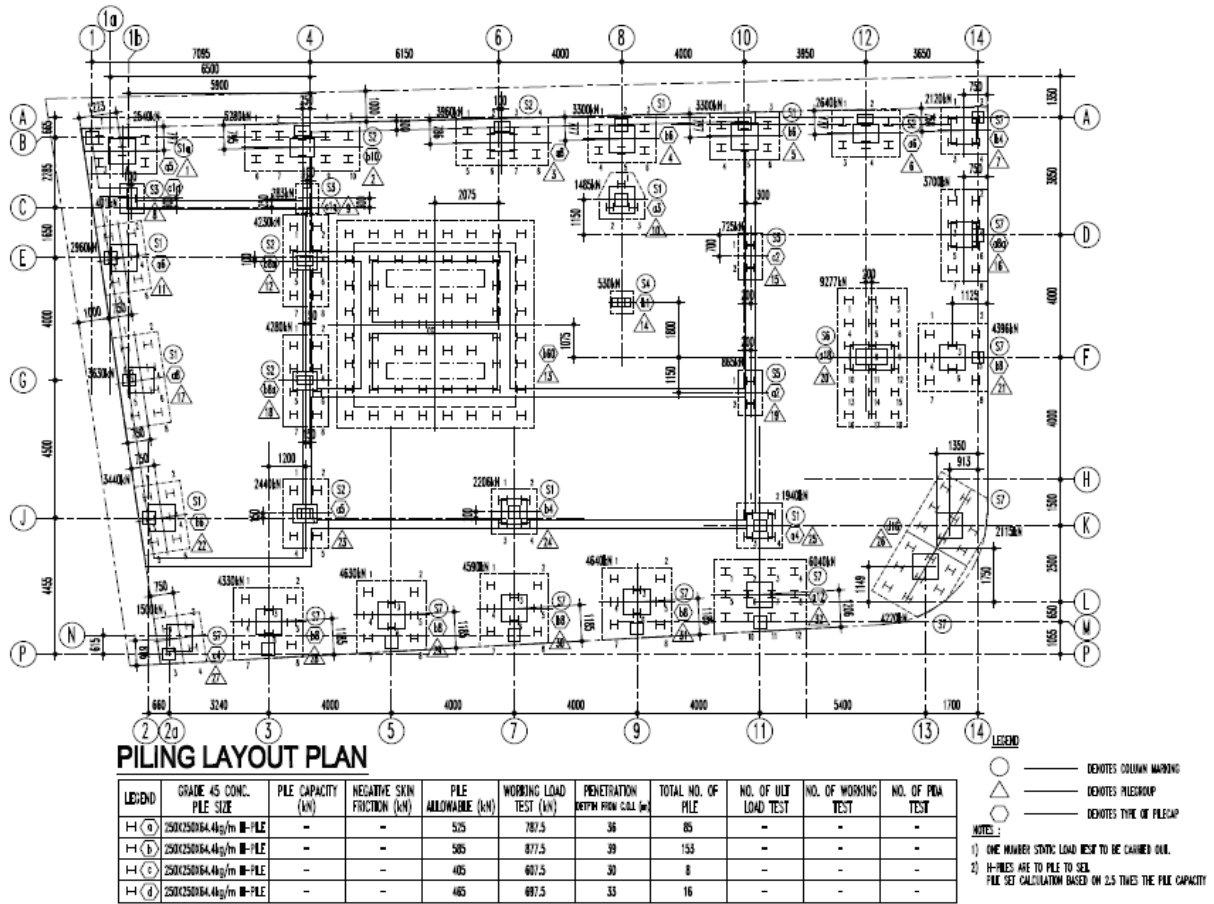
Pile layout plan, a total 256 steel H-piles will be driven into the ground.
